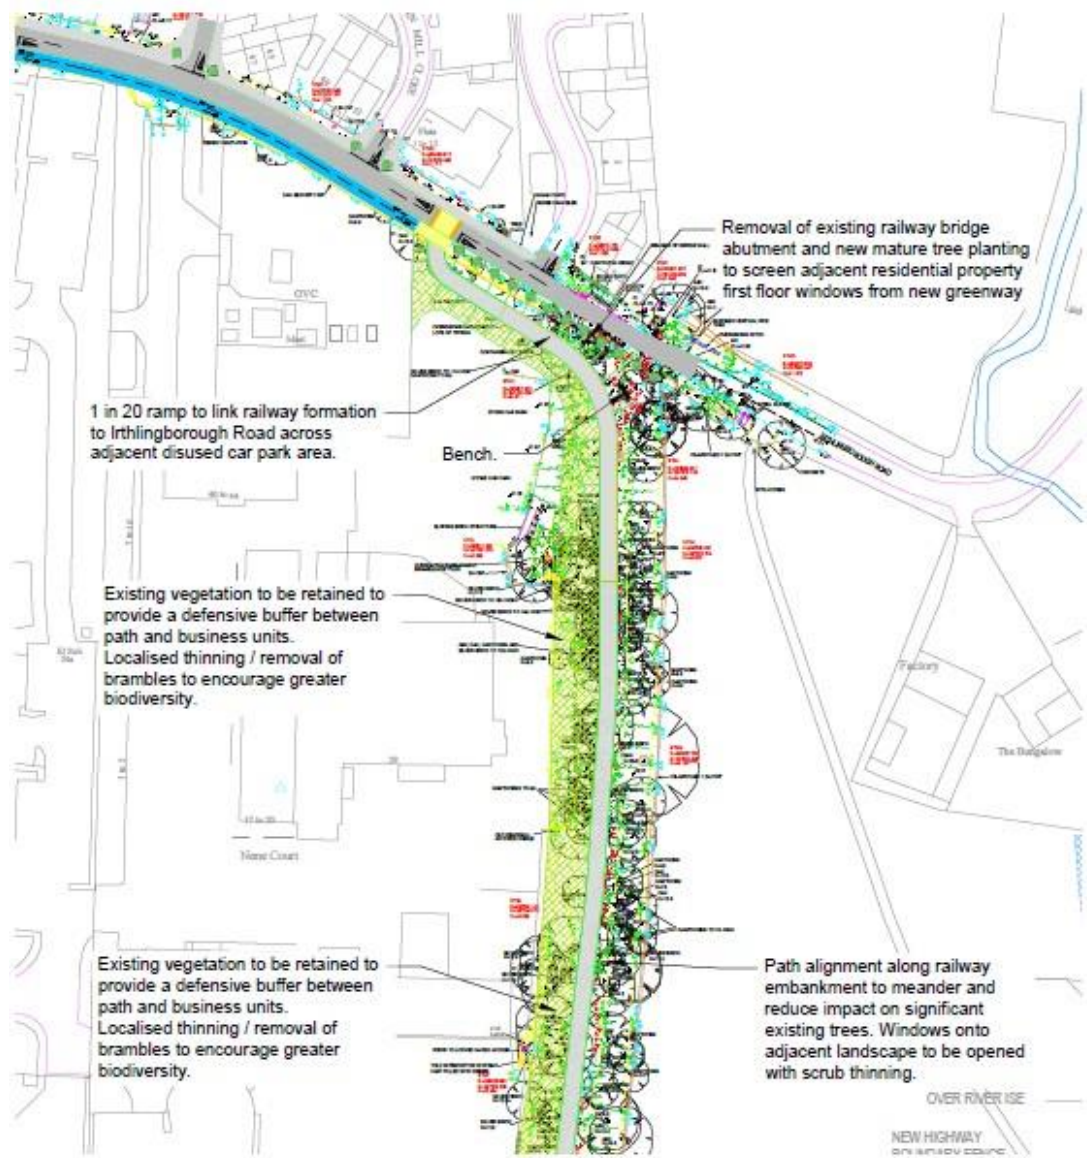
Indicative plan for the development of the railway alignment (northern section).
